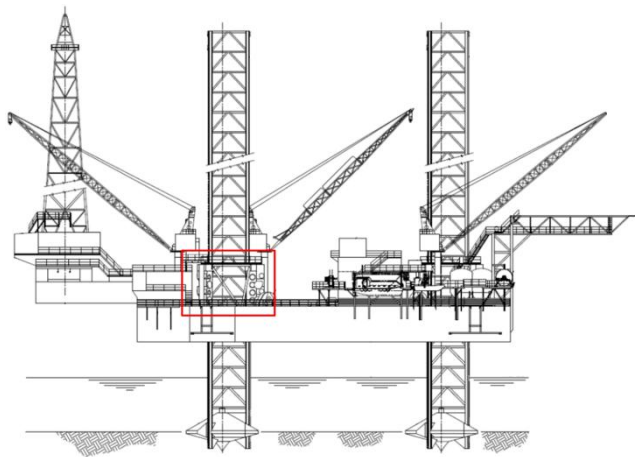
Side view of three-legged jack-up platform with the jacking house marked in the frame (based on [33]).
